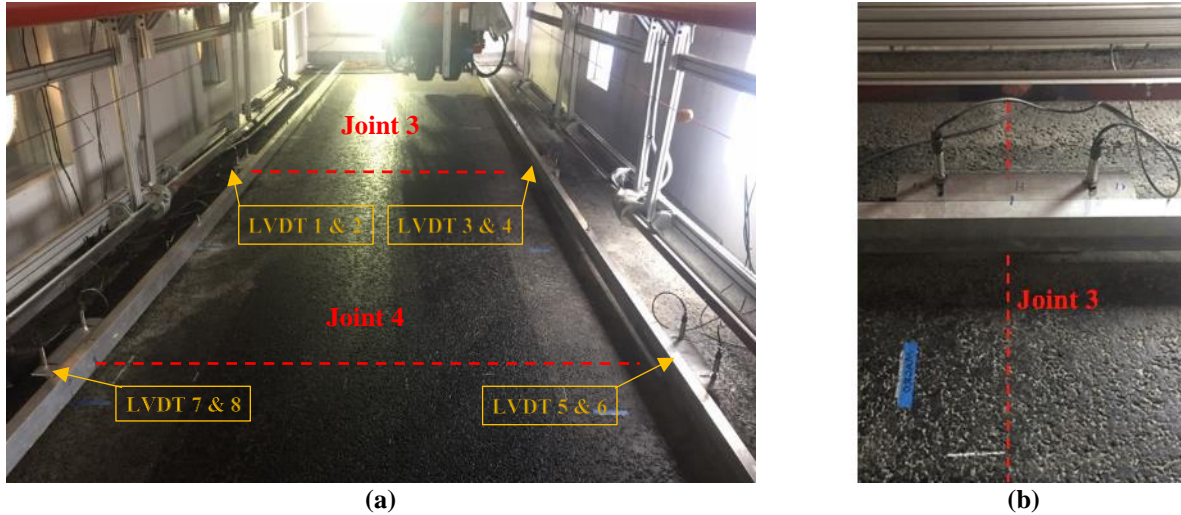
(a) LVDTs located in Joints 3 and 4; (b) LVDT installed at Joint 3.
